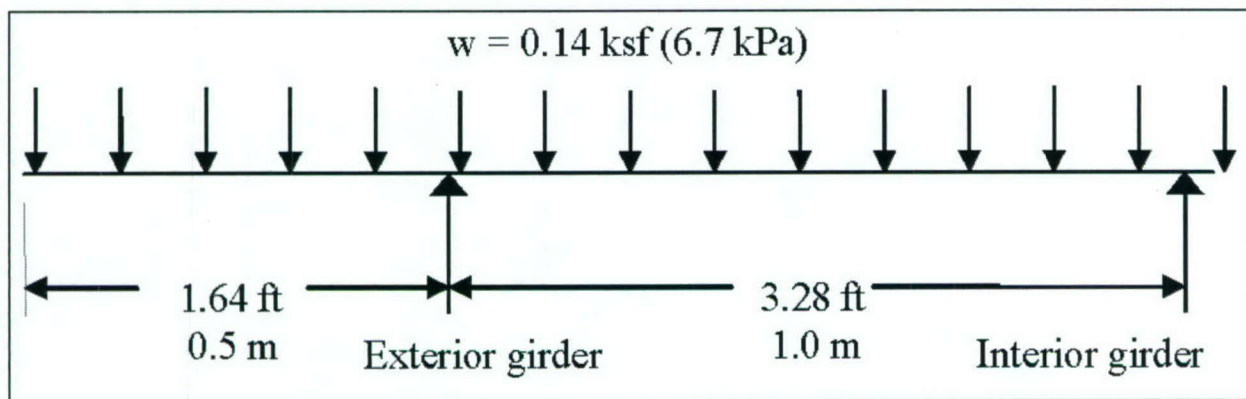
Exterior and adjacent interior girder supporting the deck (GDH 1953b)
